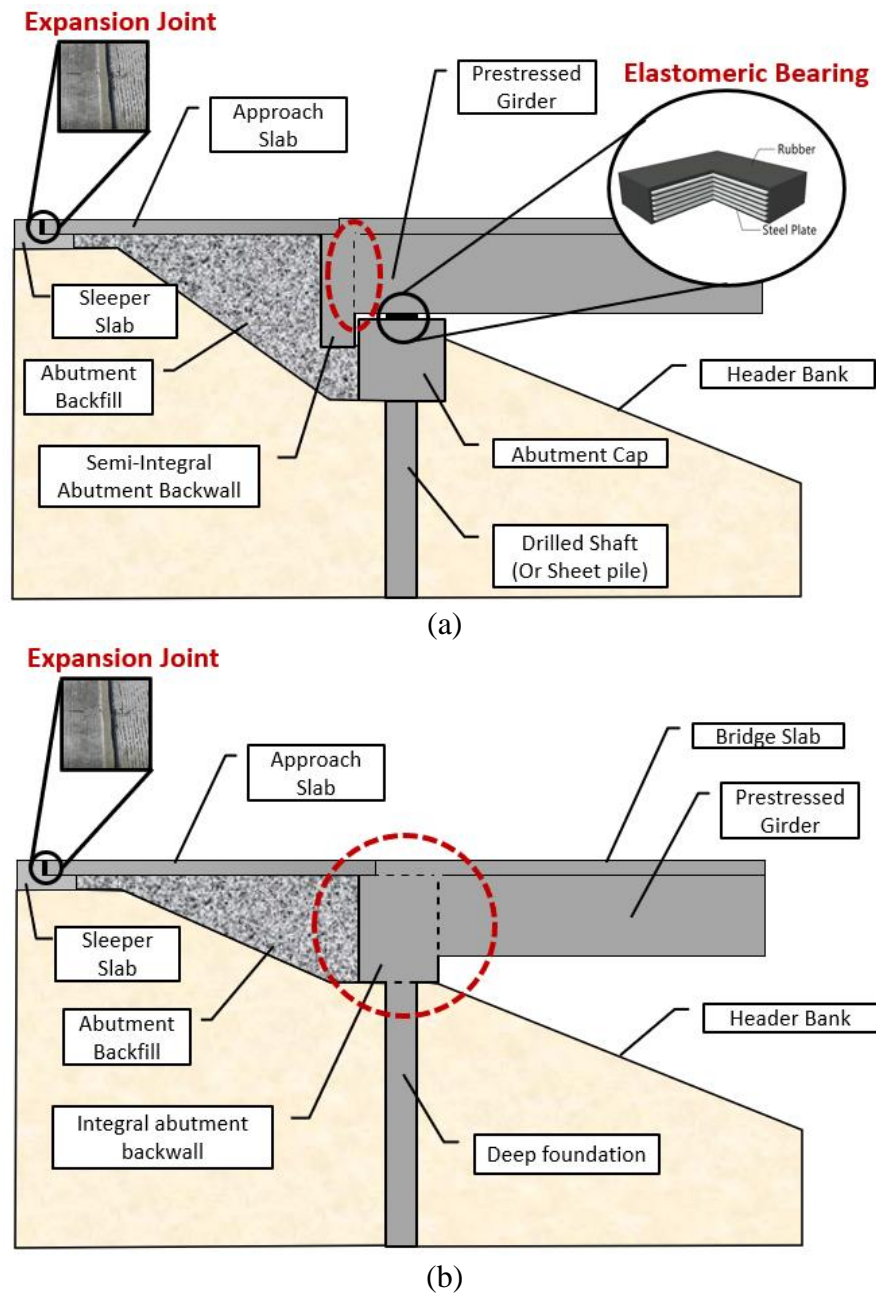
3: General sketch of jointless bridge abutments (a) semi-integral bridge abutment (b) integral bridge abutment
